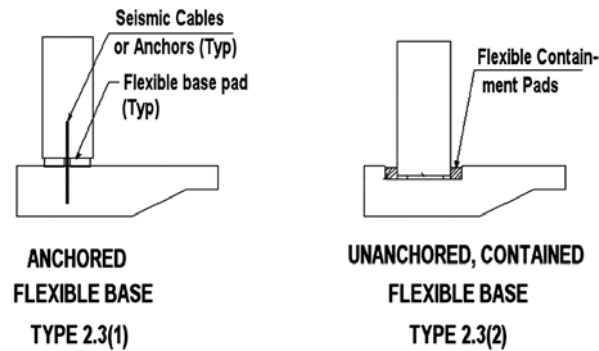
Types of ground-supported, liquid-containing structures classified on the basis of their wall-to-footing connection (after [1]).
